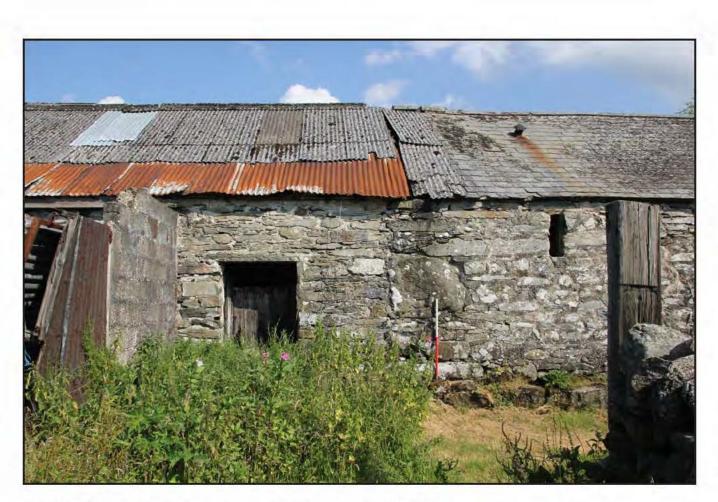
Southeast facing external elevation (centre), from the southeast. Scale 1.0m.
